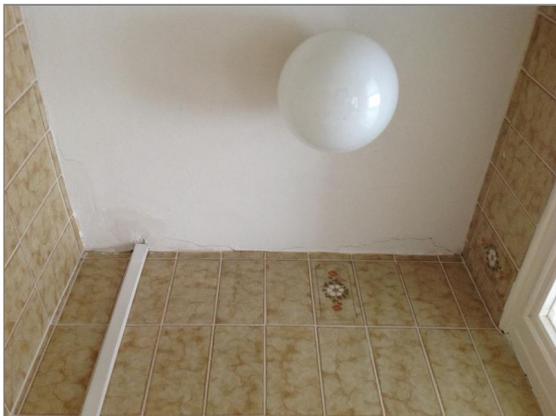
Perimeter cracking to downstairs toilet ceiling
